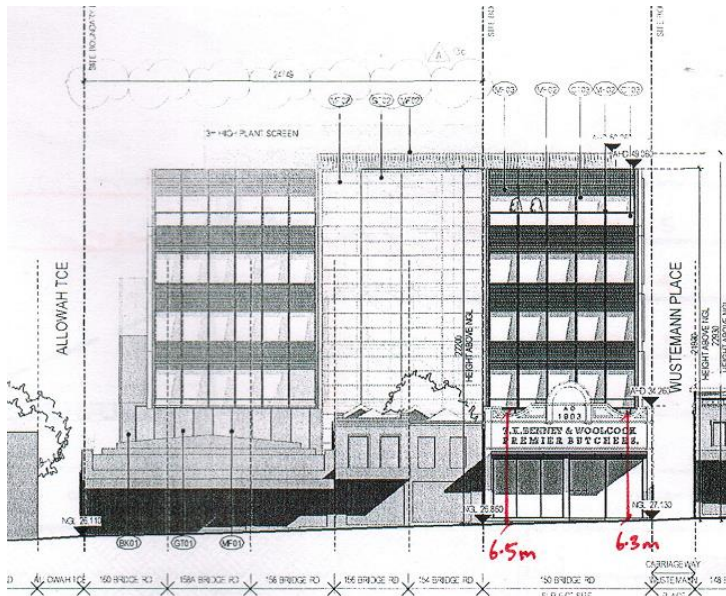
Bridge Road parapet height, as per DDO21 requirements
